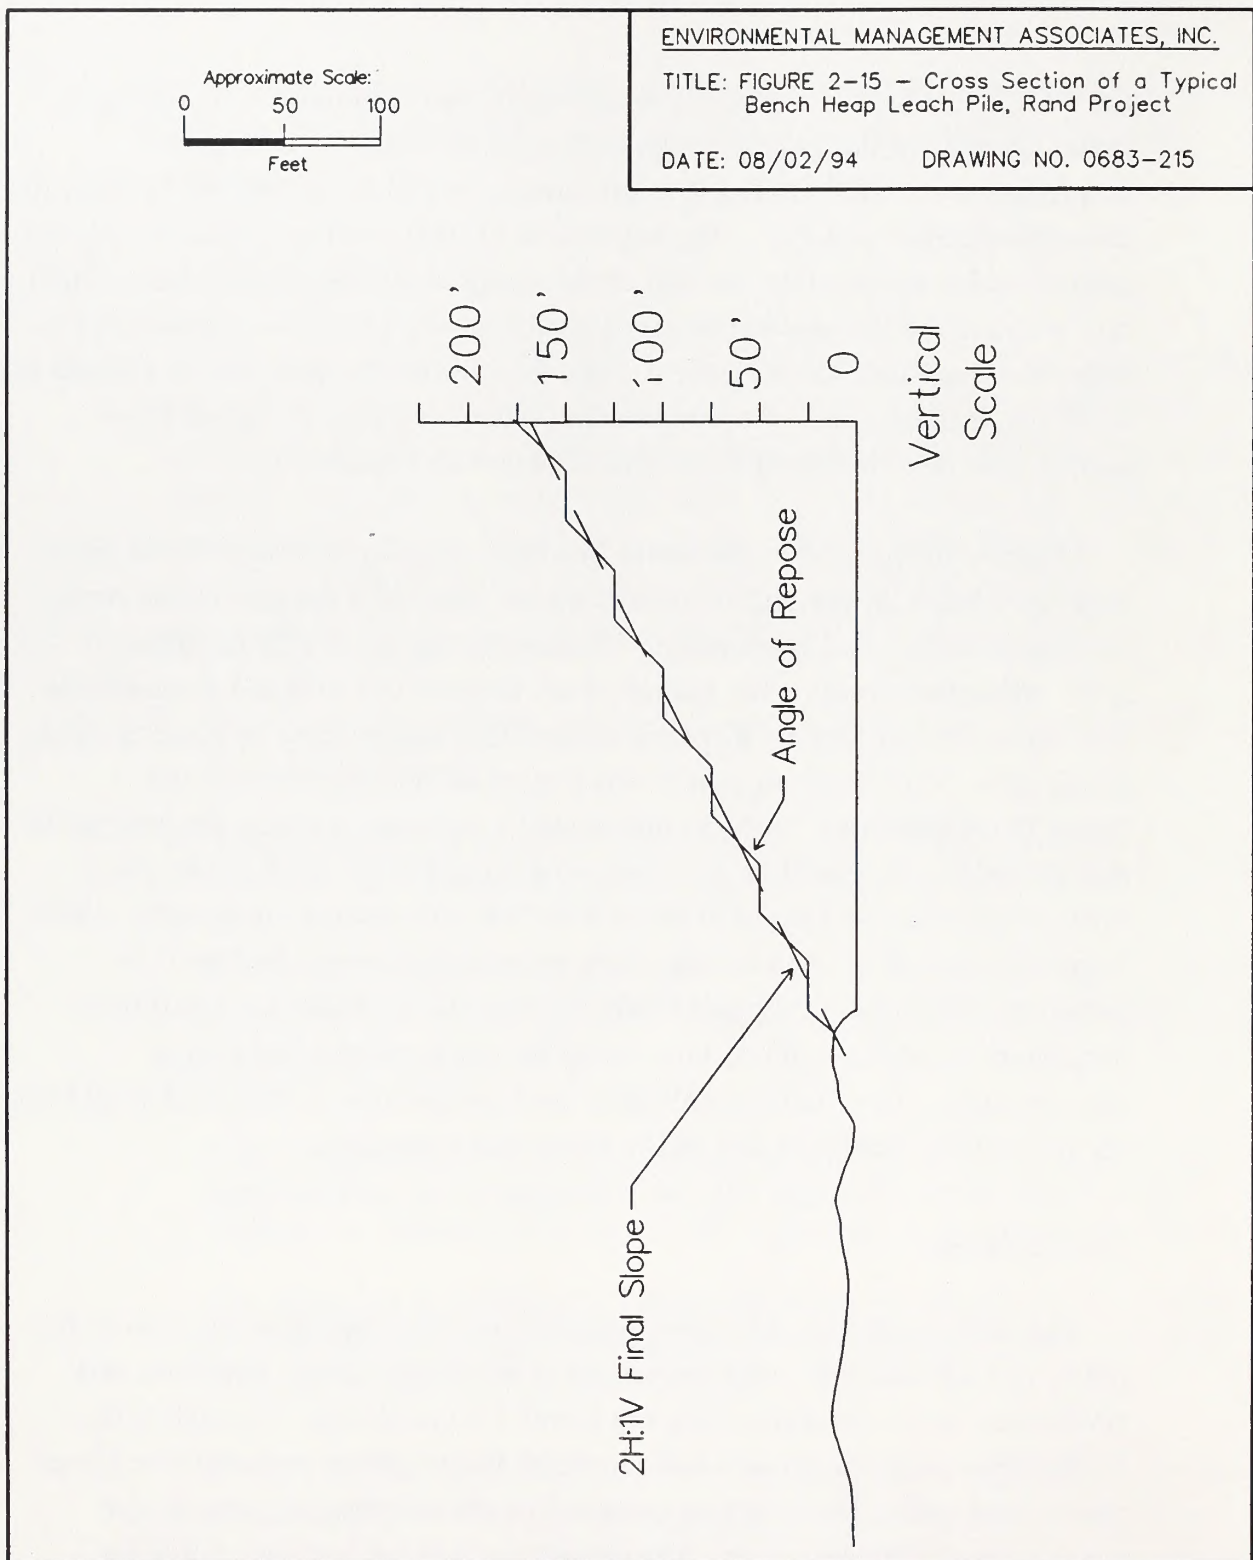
Cross Section of a Typical Bench Heap Leach Pile, Rand Project
